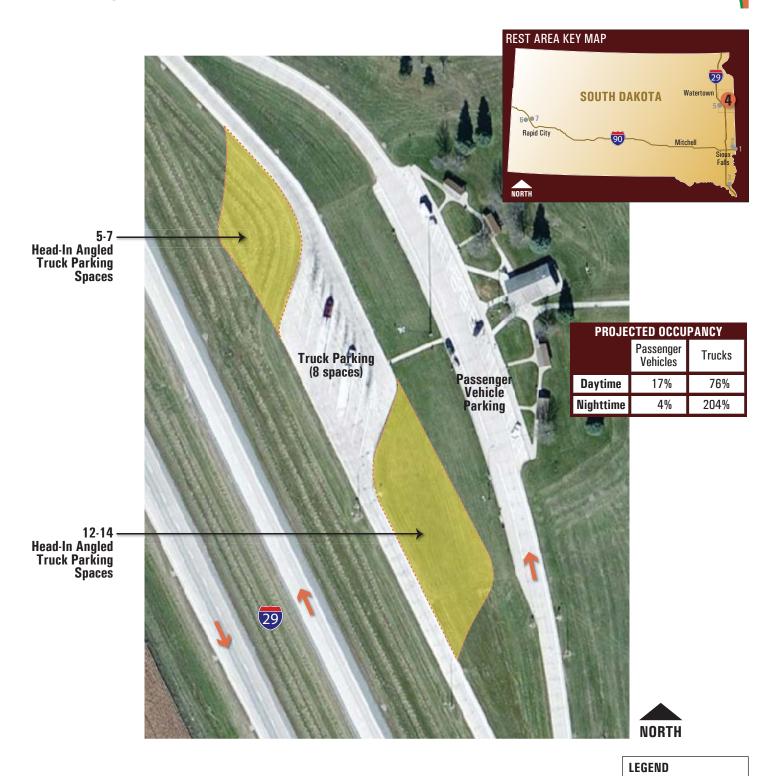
Hidewood Northbound Rest Area Future Expansion Potential
